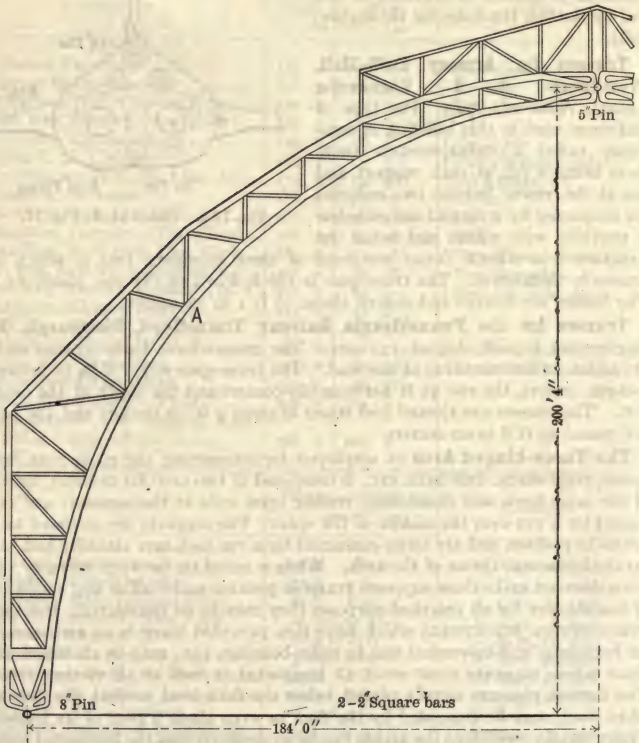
Half Truss. Three-hinged Arch. Manufactures and Liberal Arts Building, Chicago Exposition
